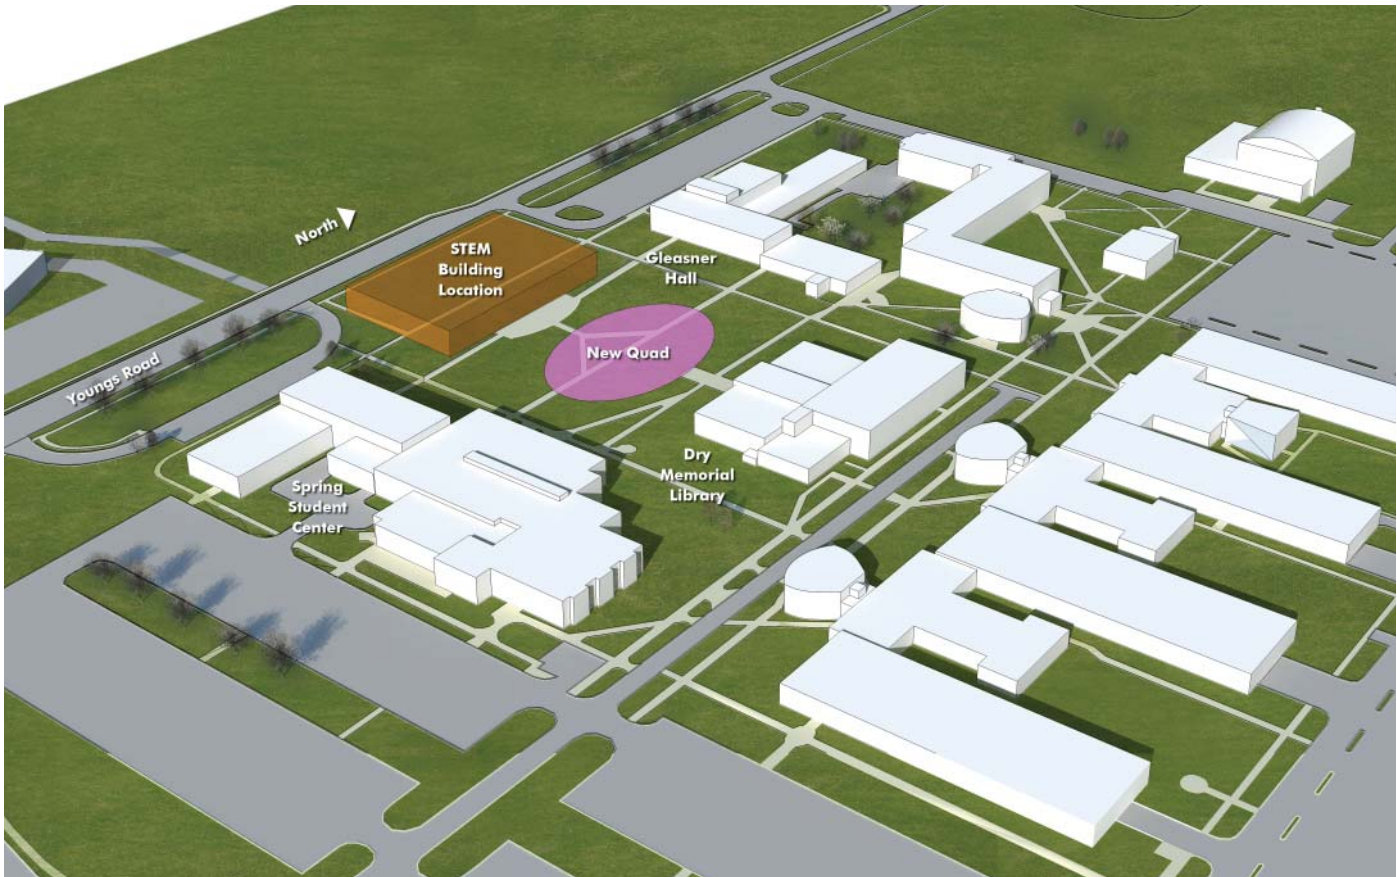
STEM Building Bird's Eye View from Southeast
